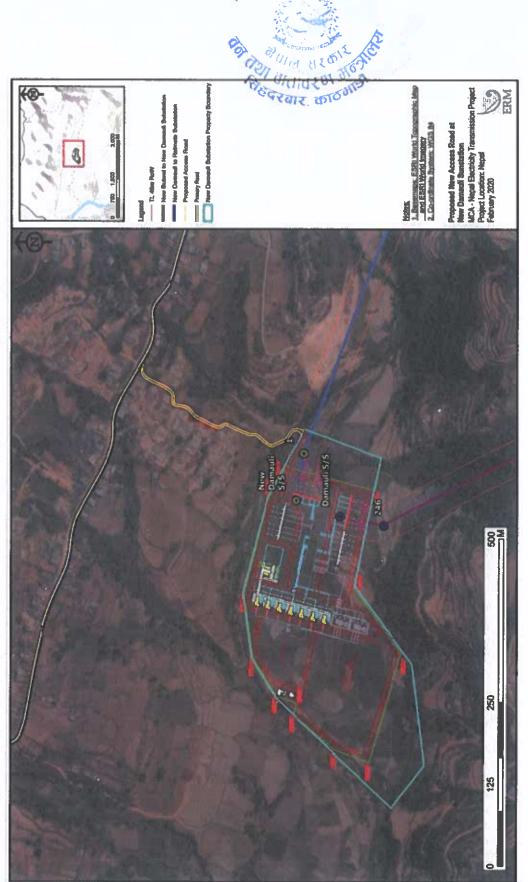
Proposed New Access Roads at New Damauli Substation
